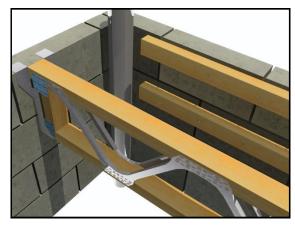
Fixing Around Soil Vent Pipe Using Bearers 38x38 bearers fixed directly to the wall to pick up both floor and ceiling.
